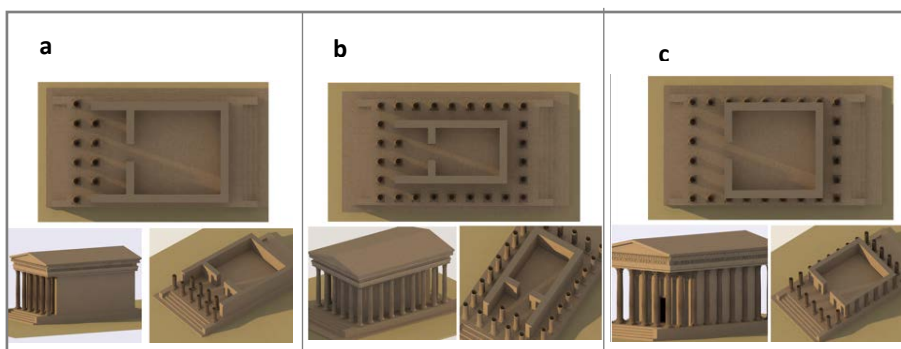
Potential restitutions of temple: a- Prostylos layout, section drawings and renders b- peripteros layout section drawings and renders c- pseudoperipteros layout, section drawings and renders.
